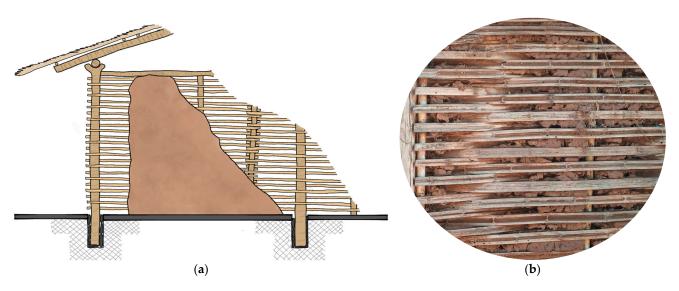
(a) Bajareque wall section drawing. (b) Current wall with a detached refurbishment.
